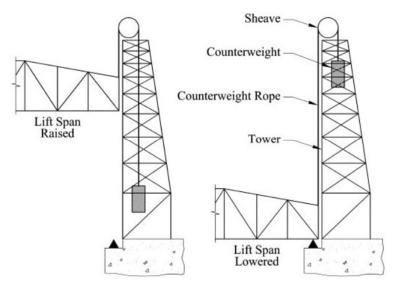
Details of Vertical Lifting Bridge [37]
